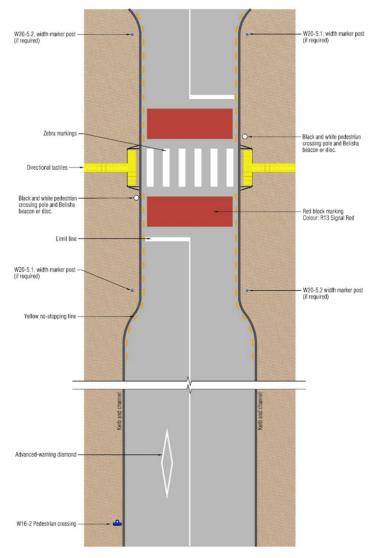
Typical layout for zebra crossing with red surfacing treatment
